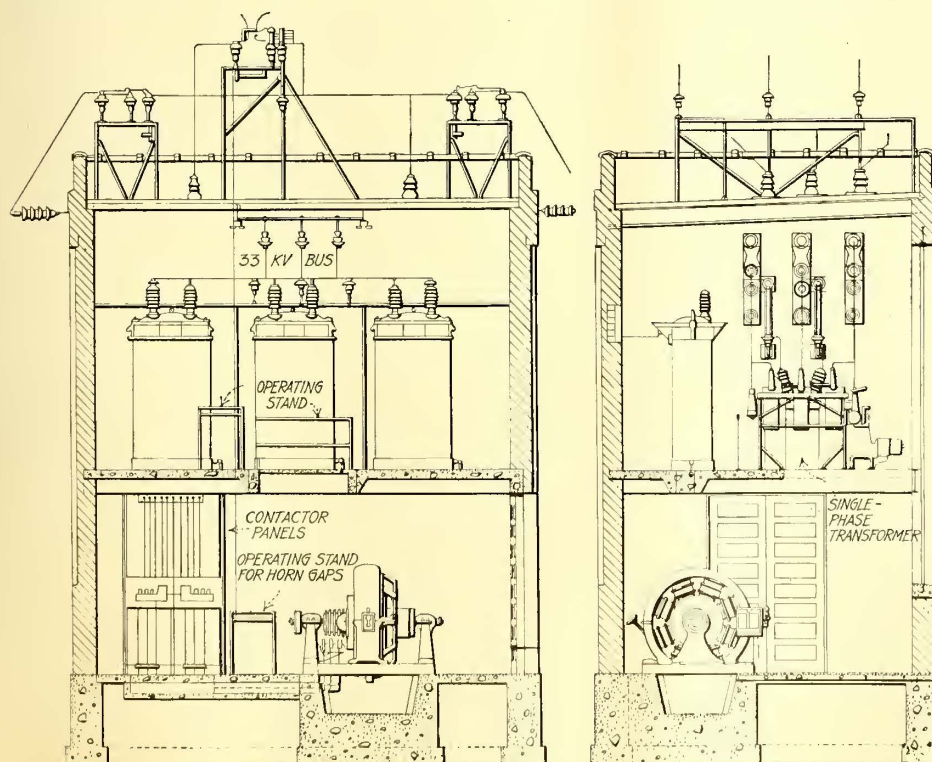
DETAILS OF AUTOMATIC RAILWAY SUBSTATION
